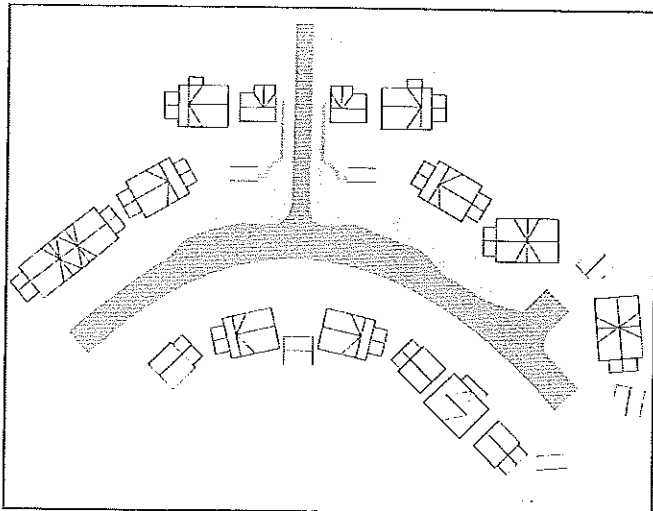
HOUSING LAYOUT & ROAD COMPOSITION
